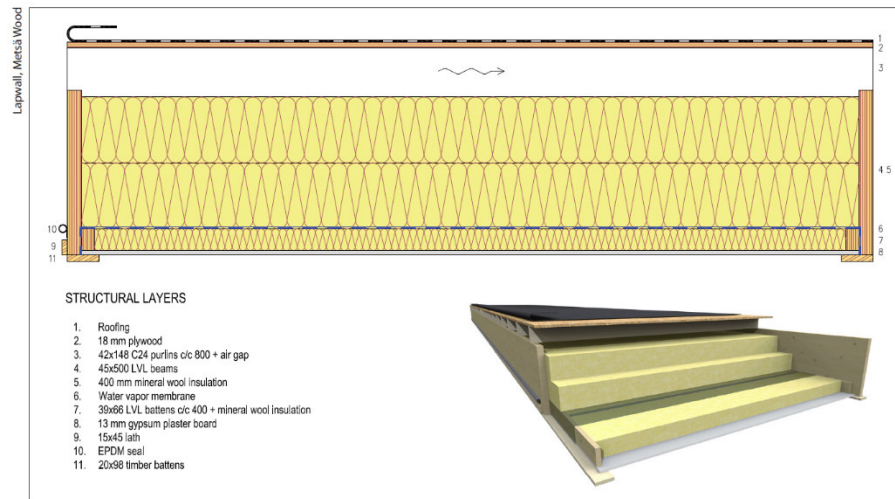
Cross section and detailing of roof elements with LVL purlins.
